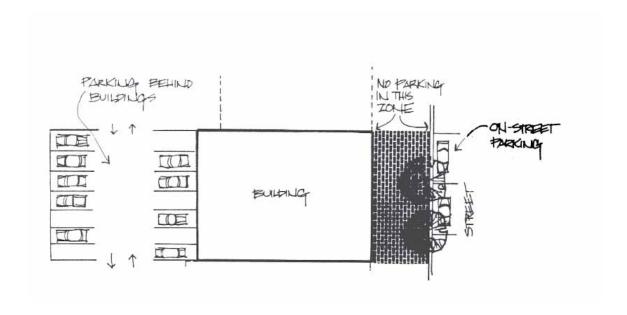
RECOMMENDED ON-SITE PARKING LOCATION
